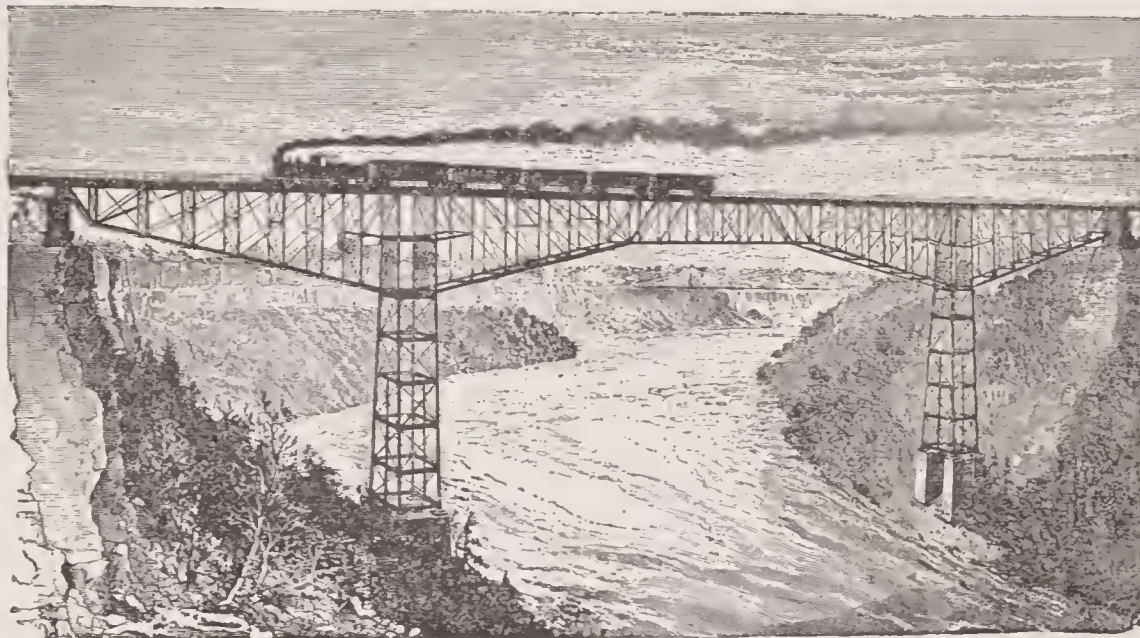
CANTILEVER RAILROAD BRIDGE AT NIAGARA.
